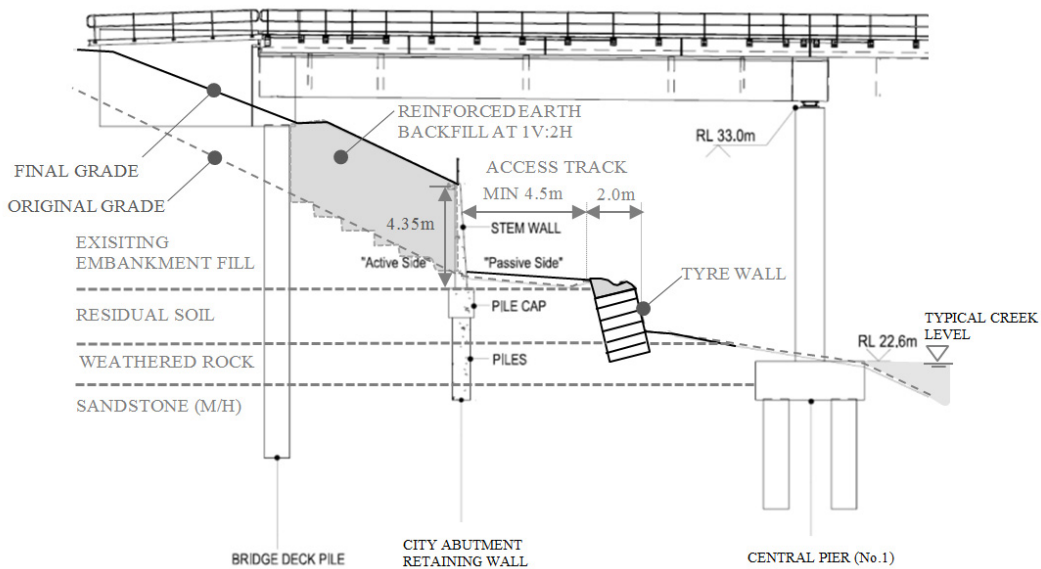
Bridge Elevation as originally proposed with high level access track on top of the proposed tyre wall
